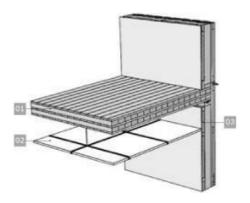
Example of a solid wood floor element (Swedish wood, n.d).
